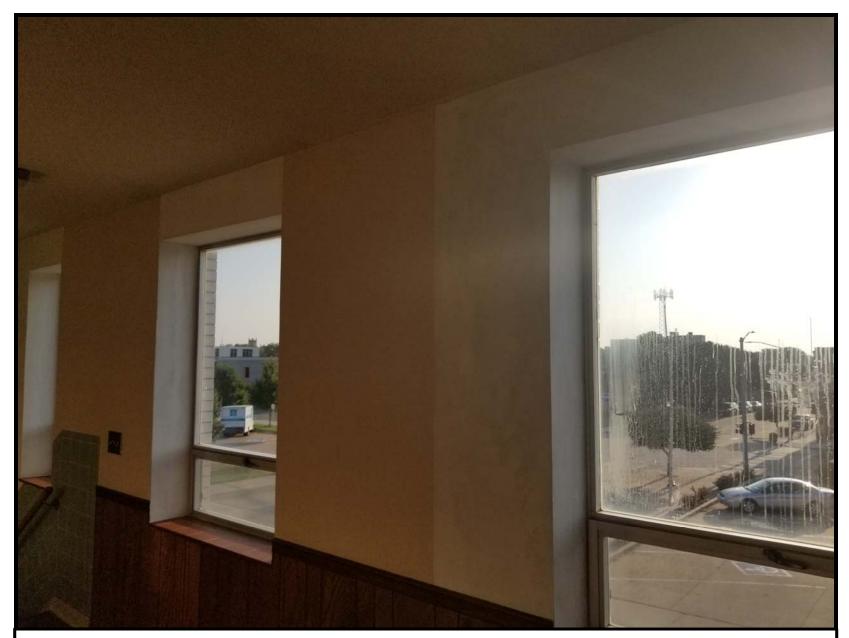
Looking northwesterly from the east end of the hallway on second floor. Remove all wallpaper from this wall and inspect for mold.
